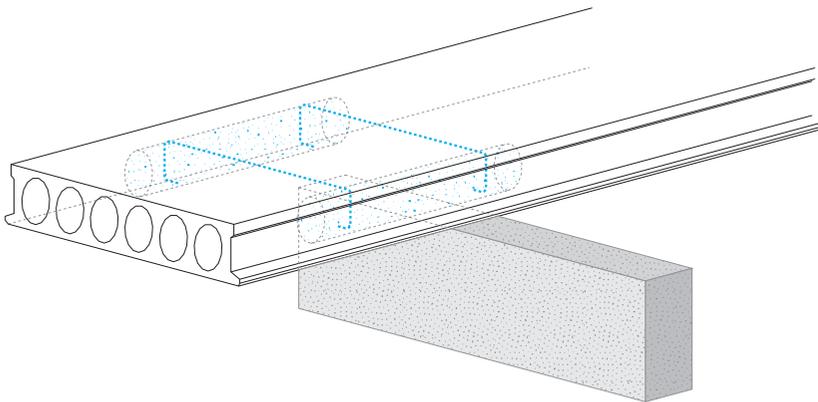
Example of transverse reinforcement inserted manually into fresh concrete of a partially supported slab.
